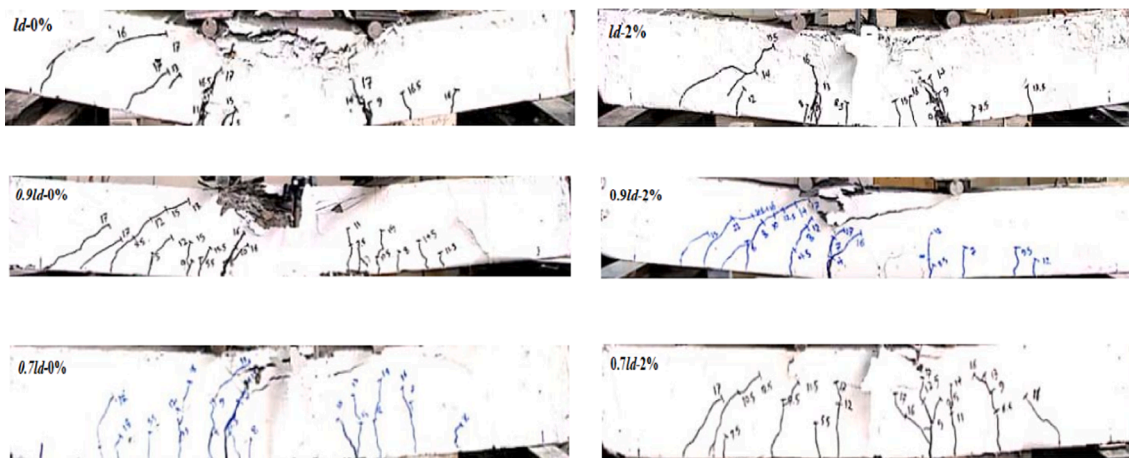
Cracks propagation and failure mode of the specimens with lap-spliced bars during loading.
